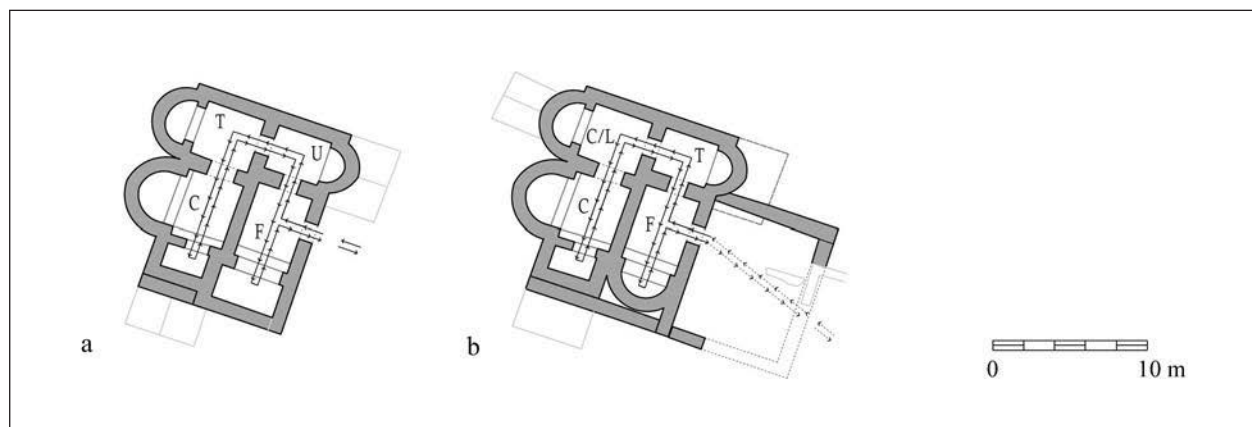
Reconstruction of the plan of the building at the level above the floor:
